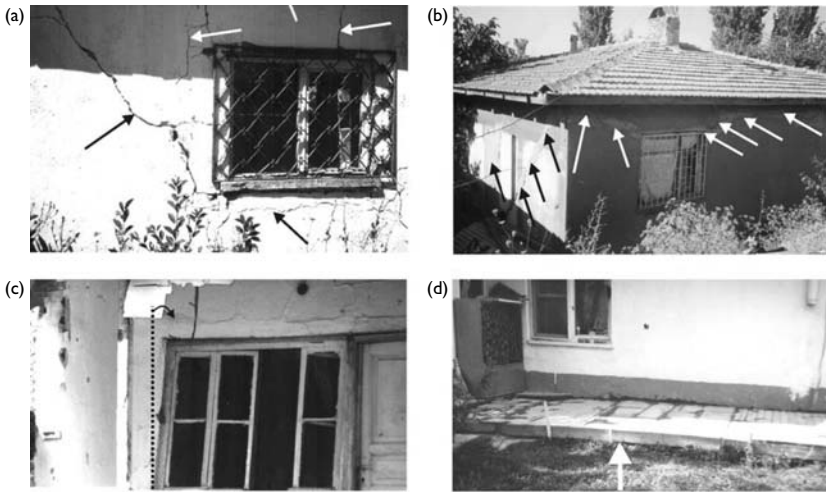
Typical views of the damaged low-rise buildings at the study site: (a) shear diagonal cracks in exterior walls as a result of upward soil expansions (case no.5), (b) diagonal cracks filled by cement (case no.18), (c) distorted window frame due to the movement of the walls (case no.13), and (d) slight doming of a floor slab due to heave (case no.10).
